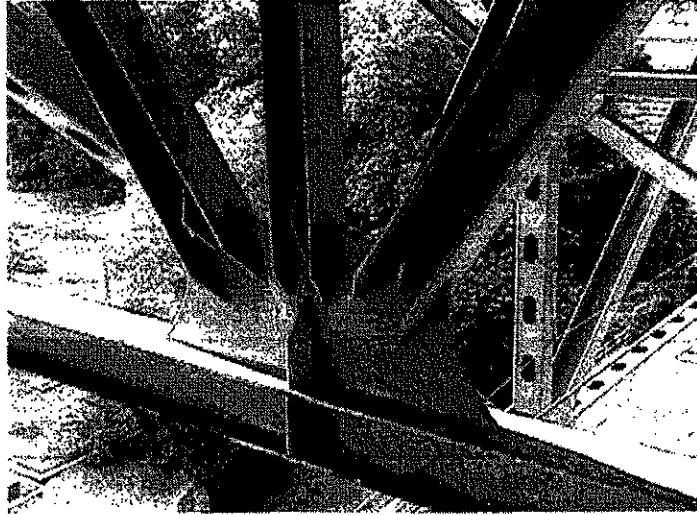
Longitudinal Stiffeners at Floor Truss Connections
